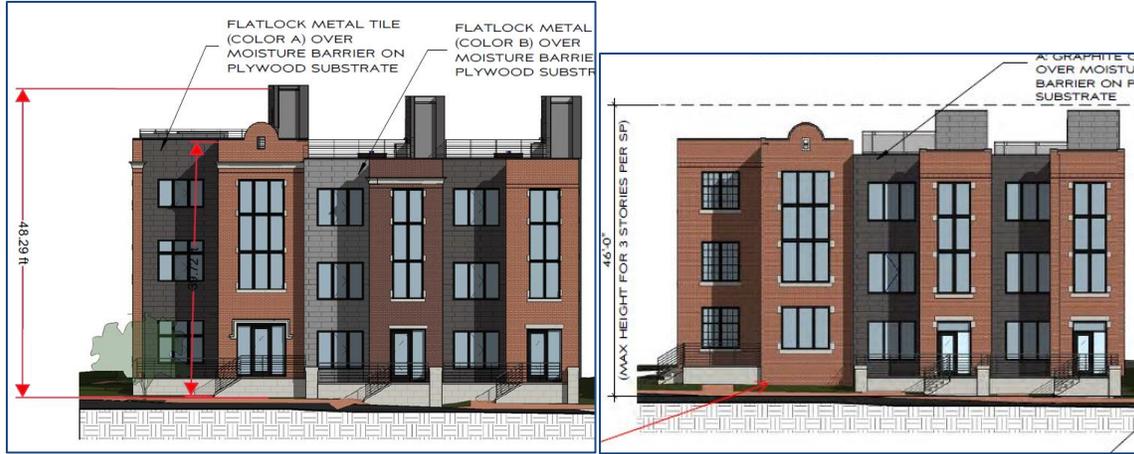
(Left) is the proposed revised Madison Street façade and Figure 7 (Right) is the previously approved plan.
